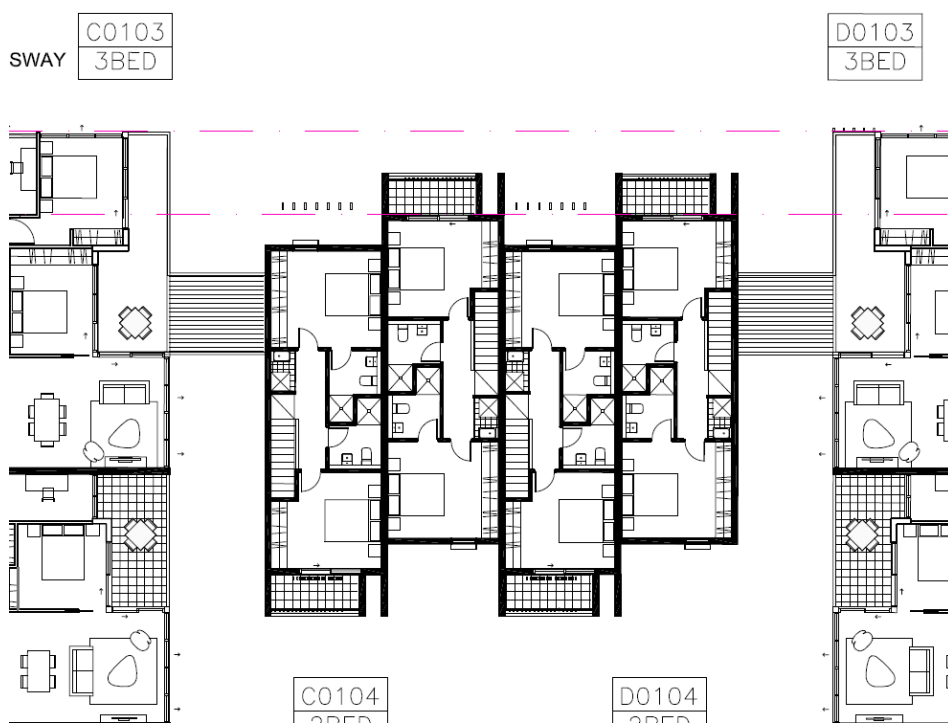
First floor plan floor plan of Building CD, located between Buildings C and D
